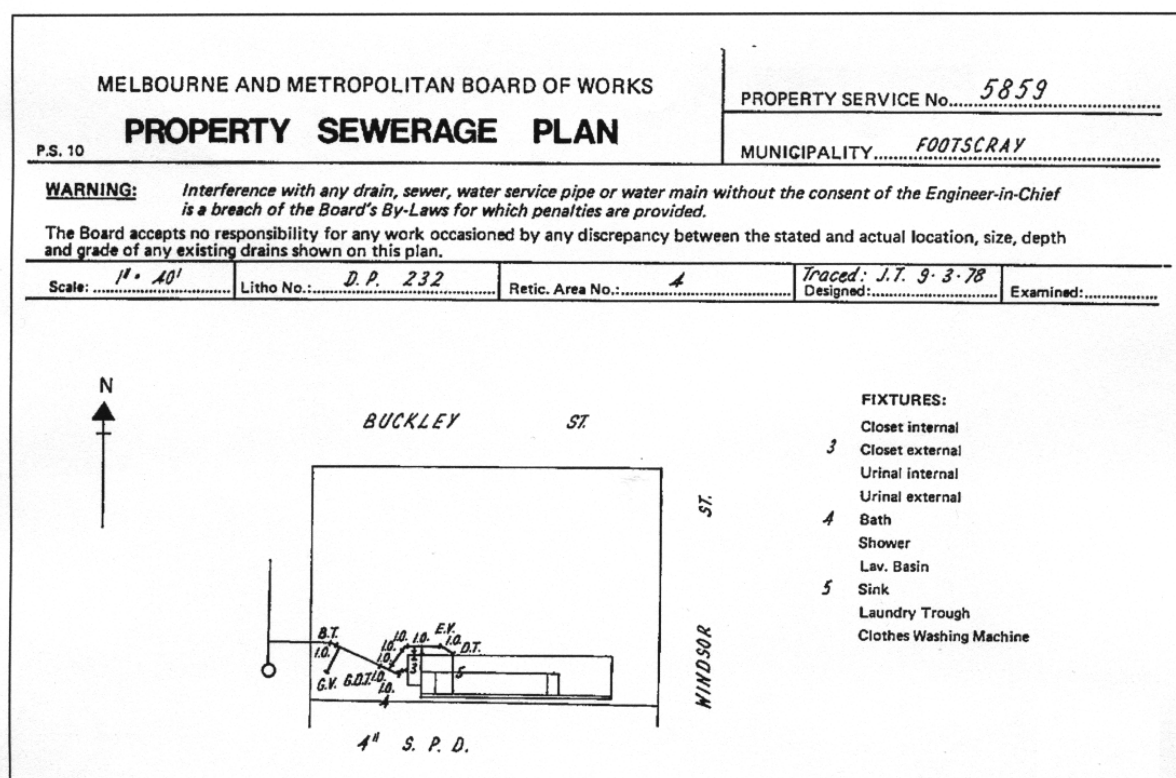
Detail of Property Service Plan No 5859, showing the extent of the site and the location of the pavilion, 1978. (Source: City West Water)
